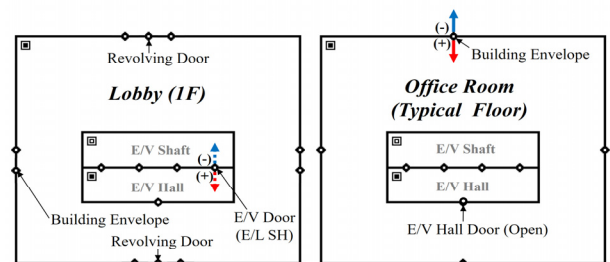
Simulation Model (The 1st Floor and the Typical Floor)
